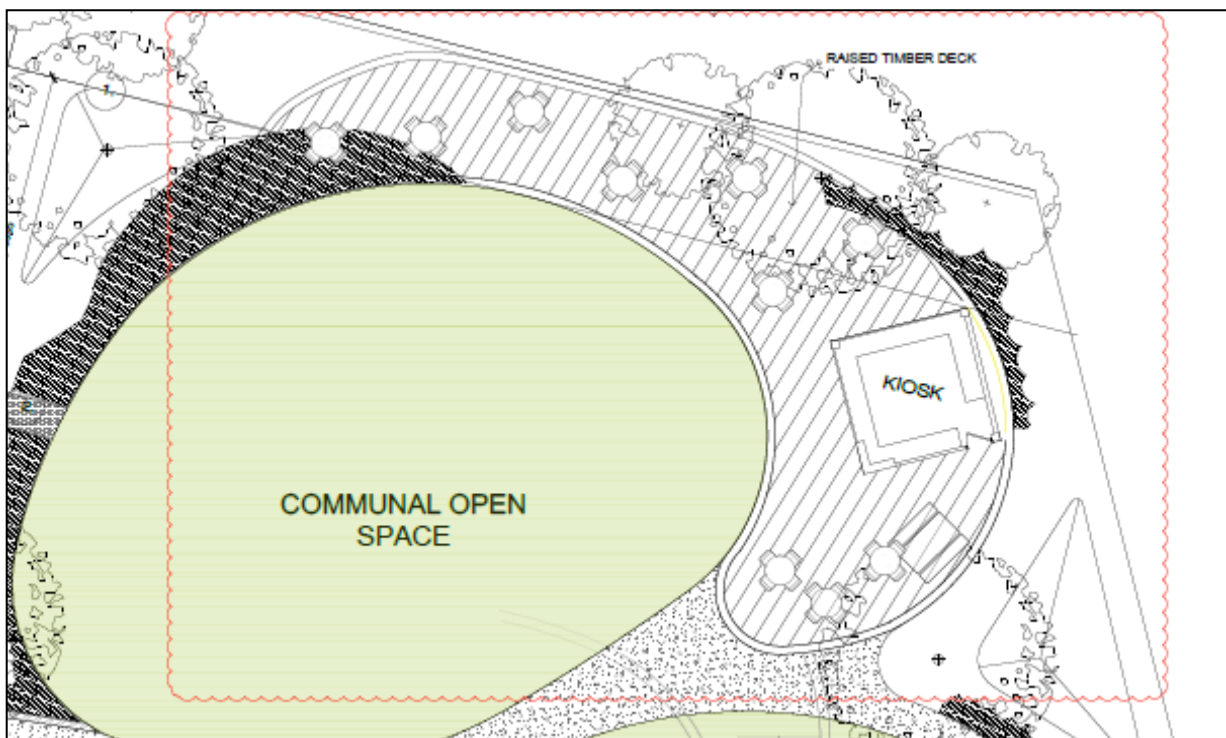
Floor Plan of kiosk as depicted on the site plan approved under DA2015/100/03.
